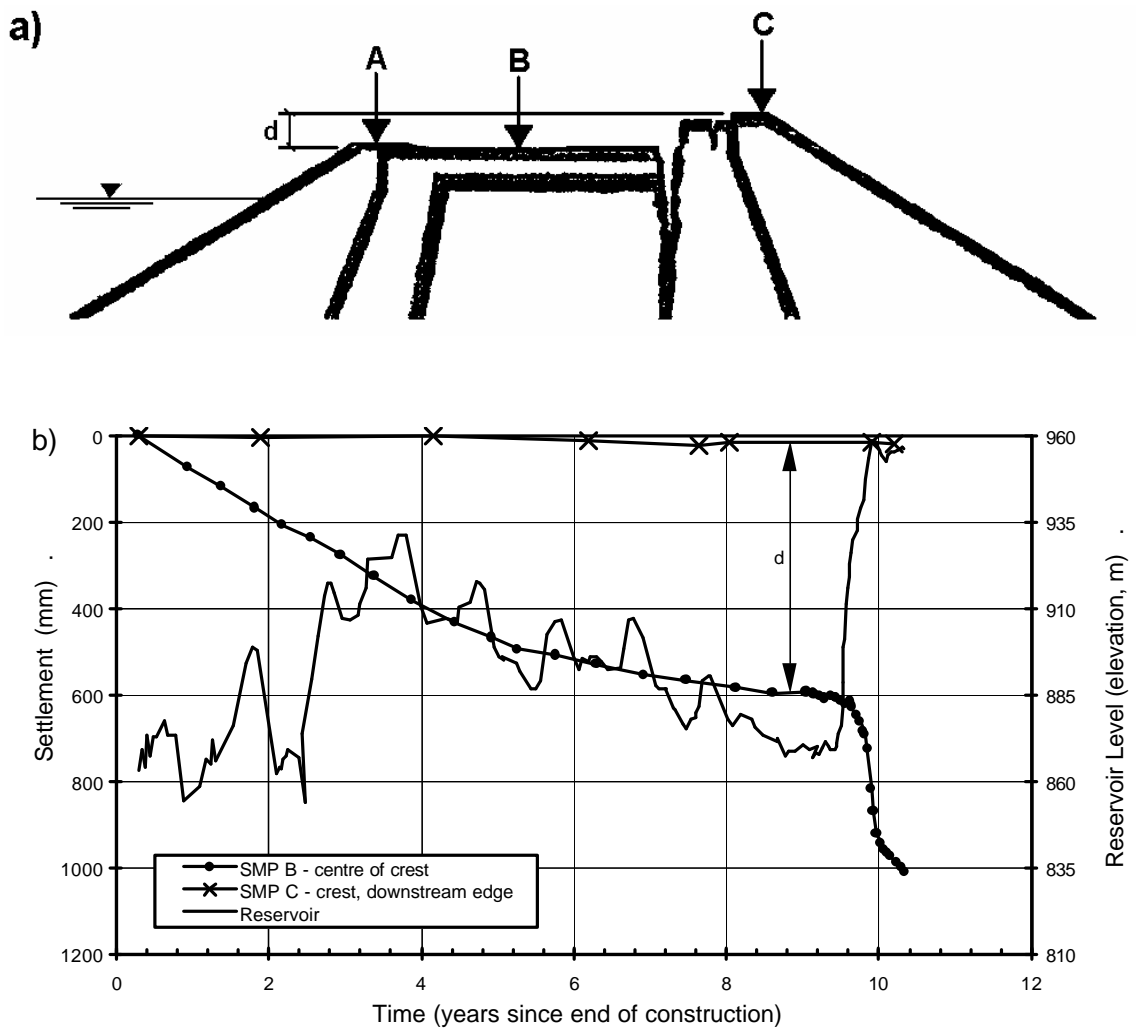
Canales dam, (a) cracking and differential settlement at the crest, and (b) post construction settlement at the crest (Giron 1997)
